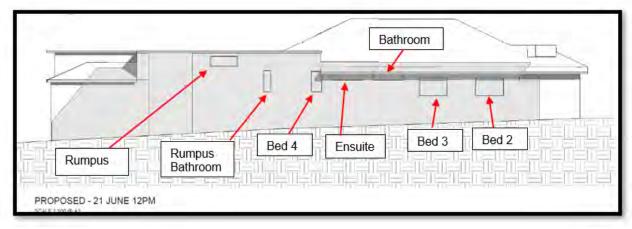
Elevational plan detailing overshadowing to No. 38 Olive Street at 12pm on June 21.
